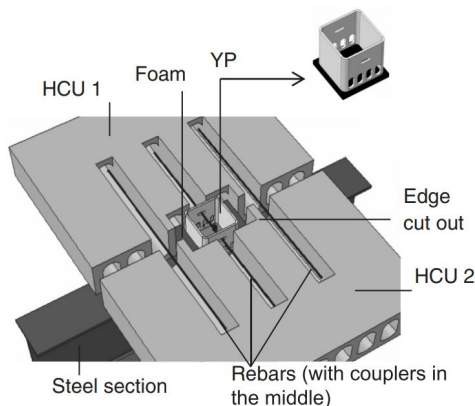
Demountable shear connection hollow core slab floor (from Feidaki et al., 2019).
